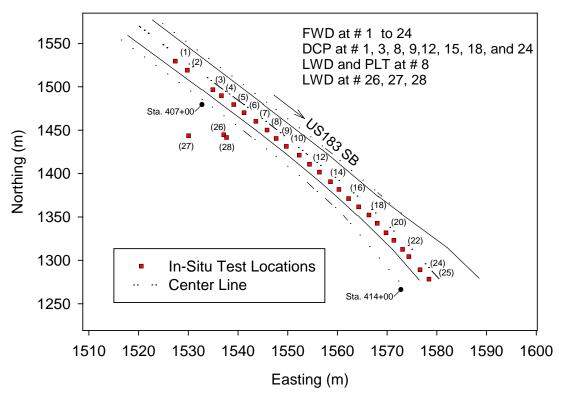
Test section plan layout US 183 Clinton, Oklahoma
